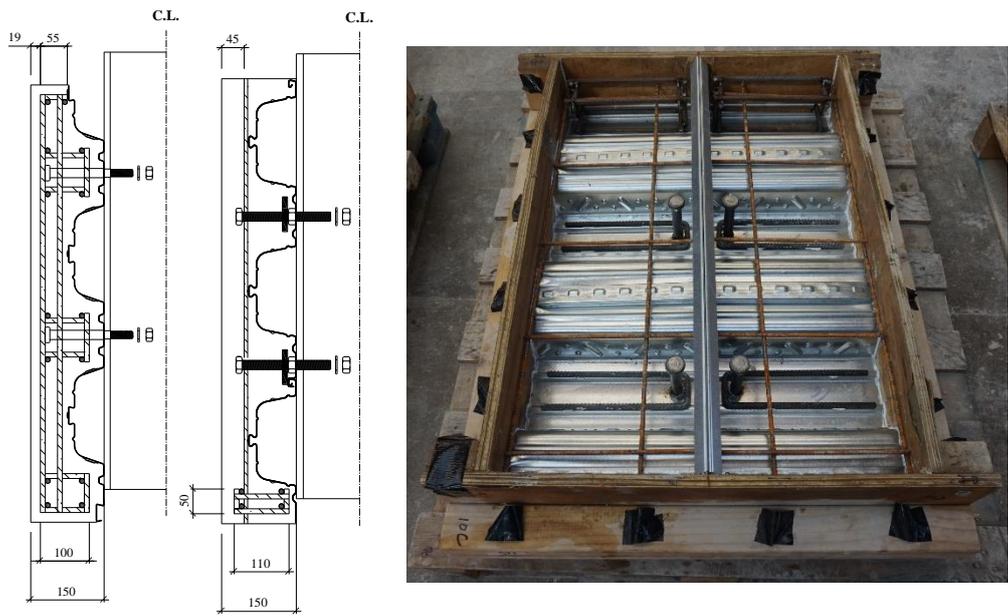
Reinforcement patterns and edge trims in the timber moulds before concreting
